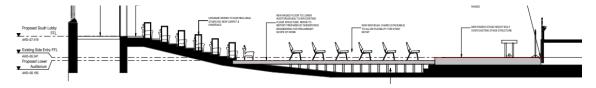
Proposed Section of the Auditorium indicating new raised flooring and stage with existing retained under. Source: Trethowan Architecture, 2024.
